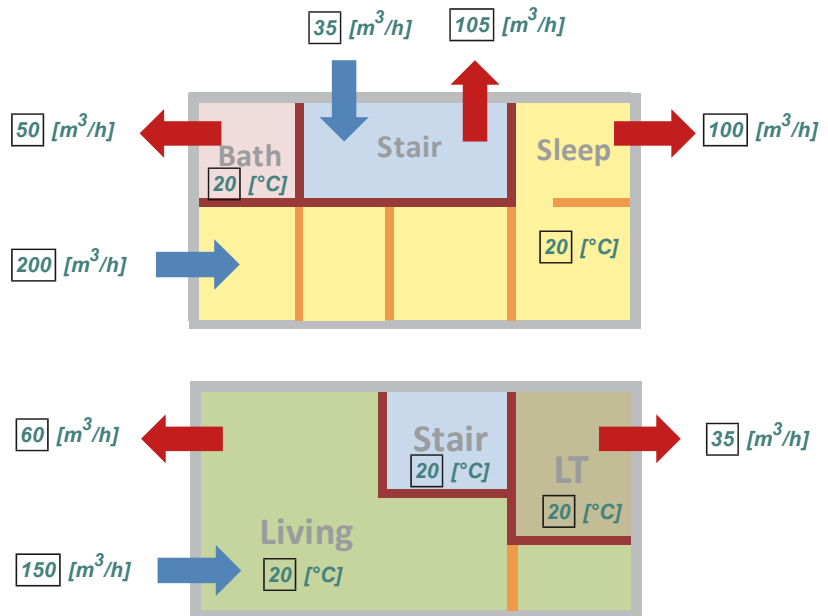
Simplified scheme of the house floor building zones with nominal outdoor air flows.
